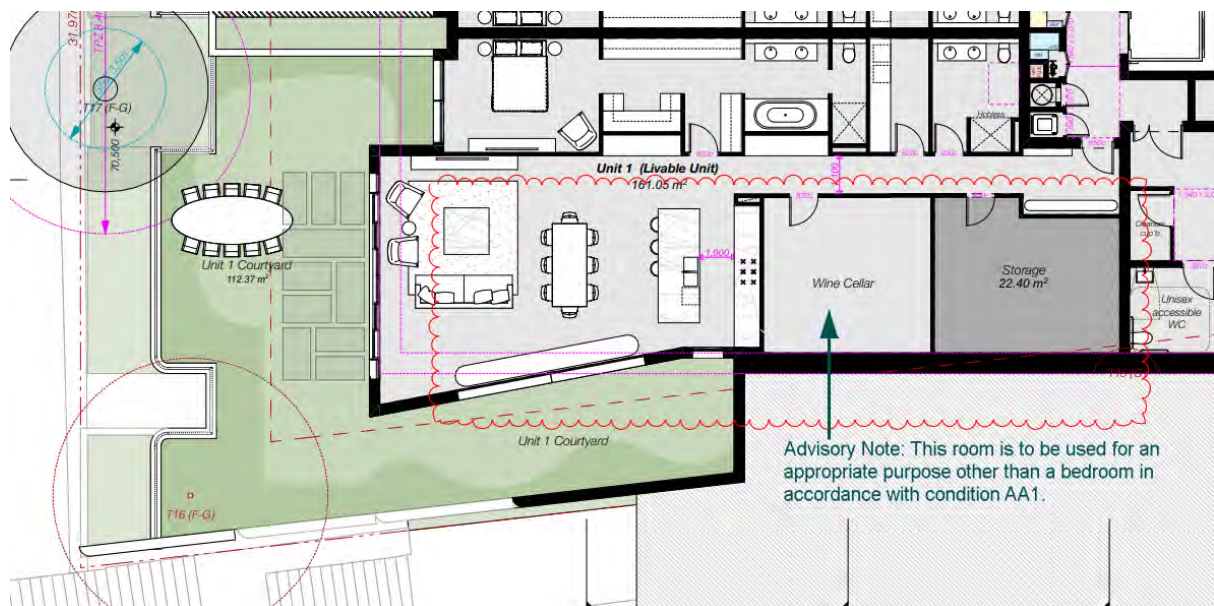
Unit 1 plan complying with Condition AA1 (Stamped Approved Plan from Operative Consent dated 11 November 2023).
